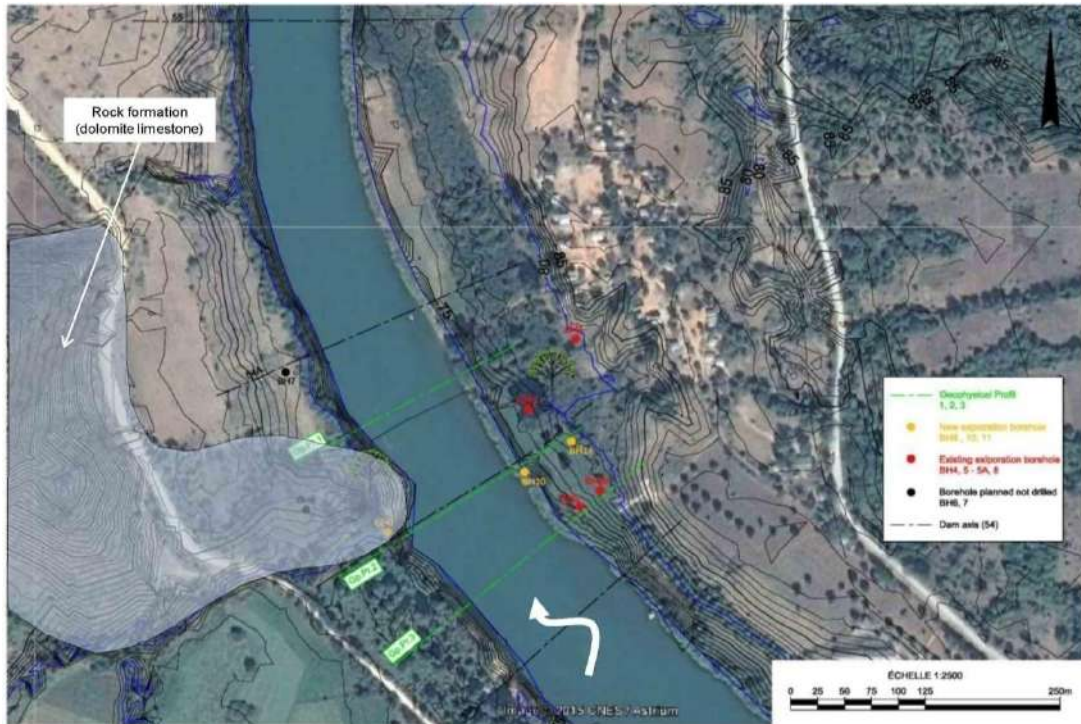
SITE AT SECTION 54 SHOWING THE OUTCROPPING LIMESTONE (LEFT BANK SITE)
